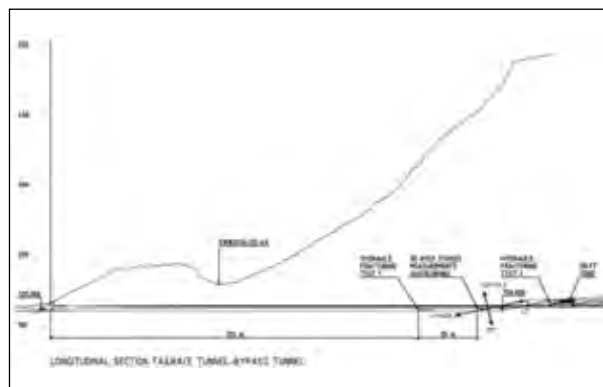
Longitudinal section of tailrace tunnel and bypass tunnel with final positioning of inlet cone.
